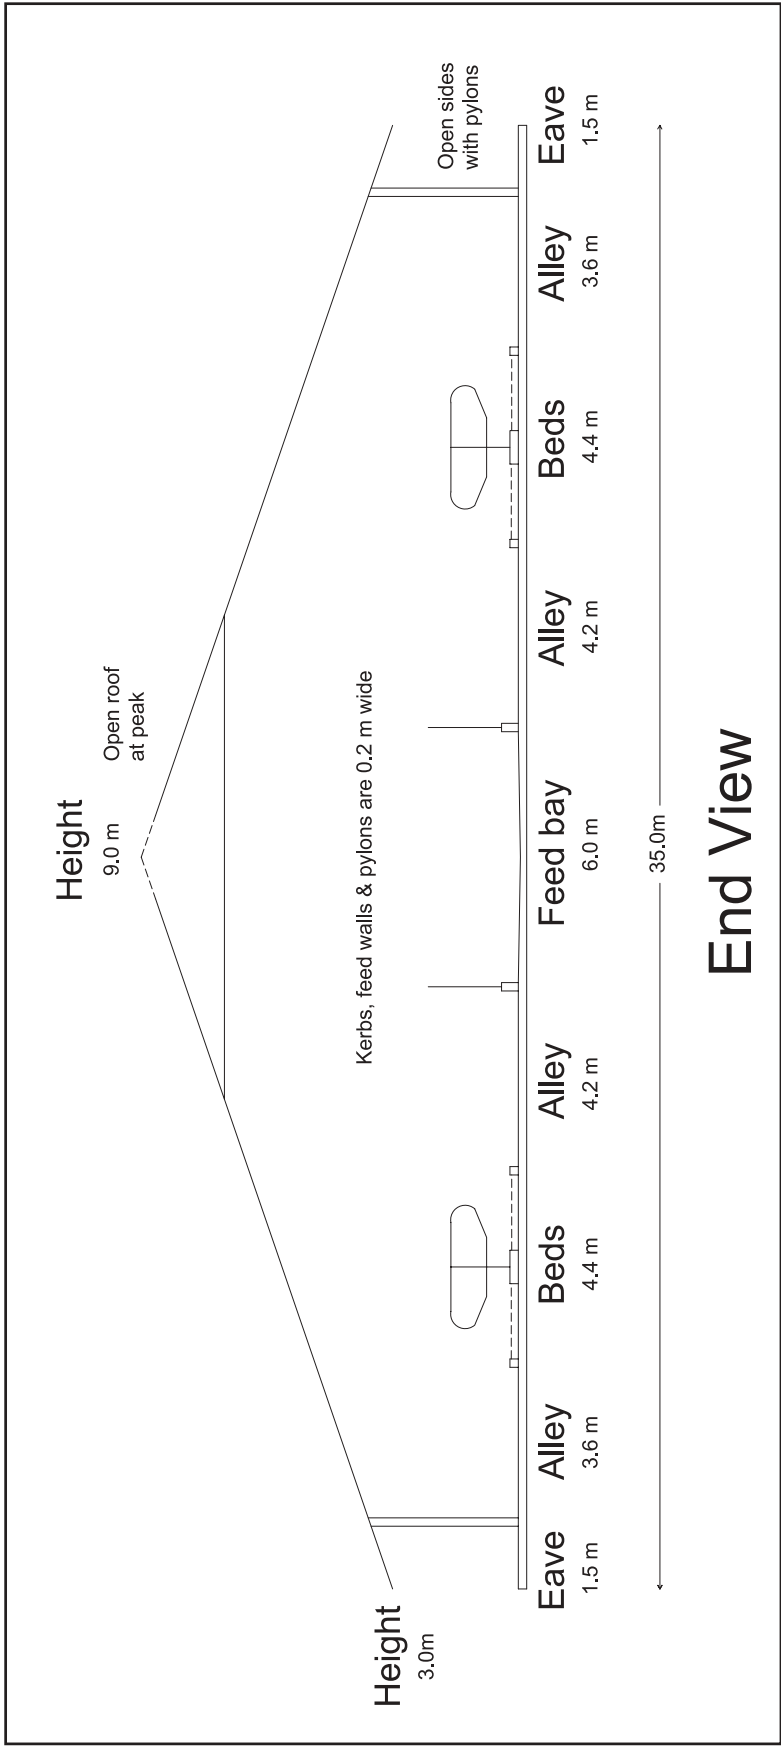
Feedpad Drawing - See Figure 20 for an example of an appropriate detailed feedpad drawing and refer to section 10.4 for details to include in the feedpad drawing.
